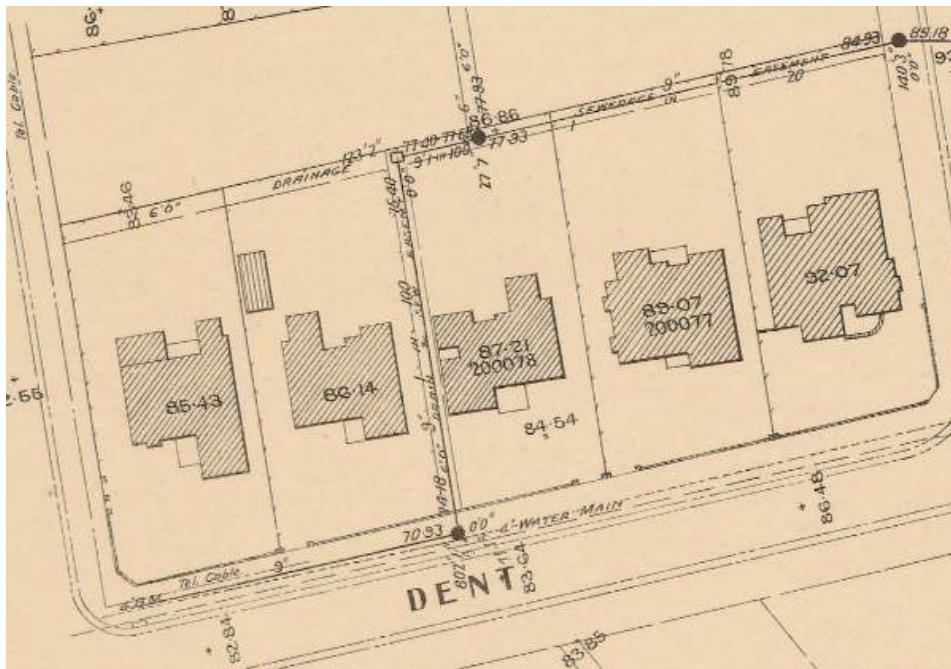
Detail of the previous figure showing five houses constructed by 1937 at 20 to 28 Dent Street.
